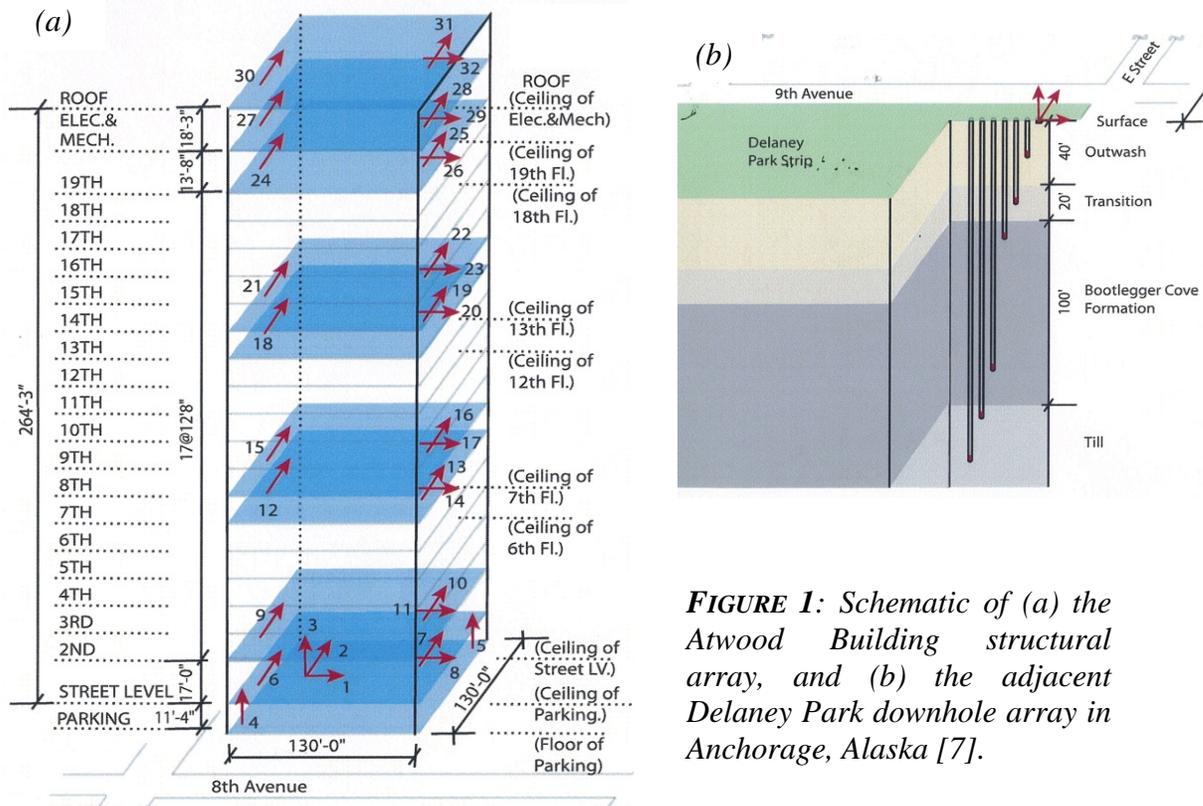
Schematic of (a) the Atwood Building structural array, and (b) the adjacent Delaney Park downhole array in Anchorage, Alaska [7].
